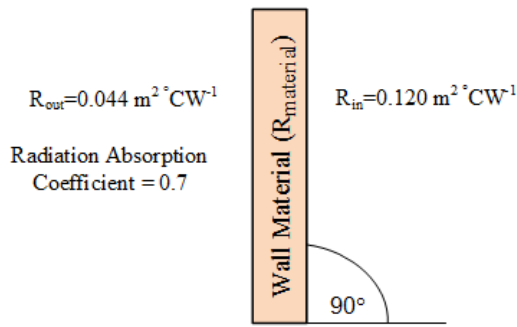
Wall model for non-plastered wall with 1 type of masonry.
